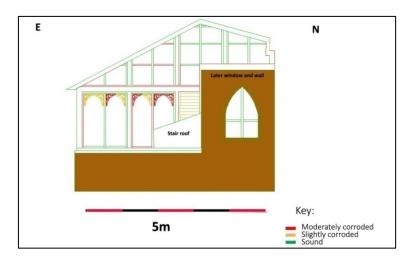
Colour coded elevation drawing of a glasshouse with partial brick walls.
